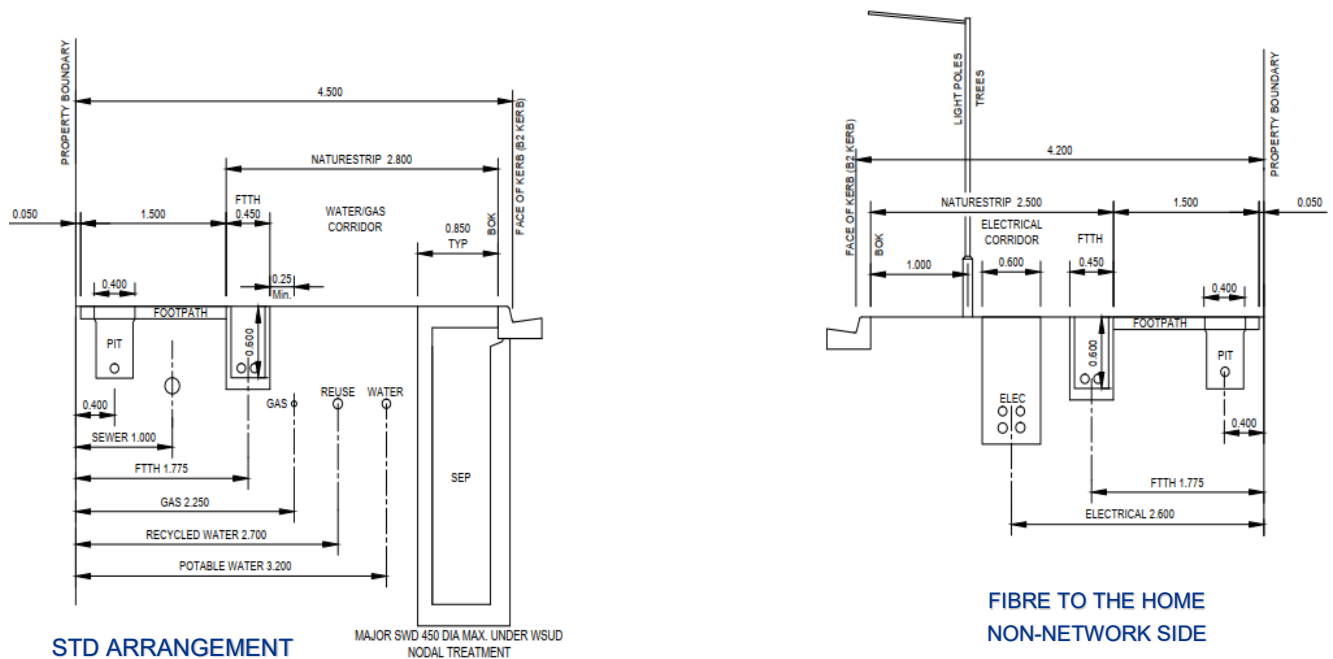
EDCM Service Locations – Cross Sections for Access Street Appendix D – Figure 003 (Sections Not To Scale)
